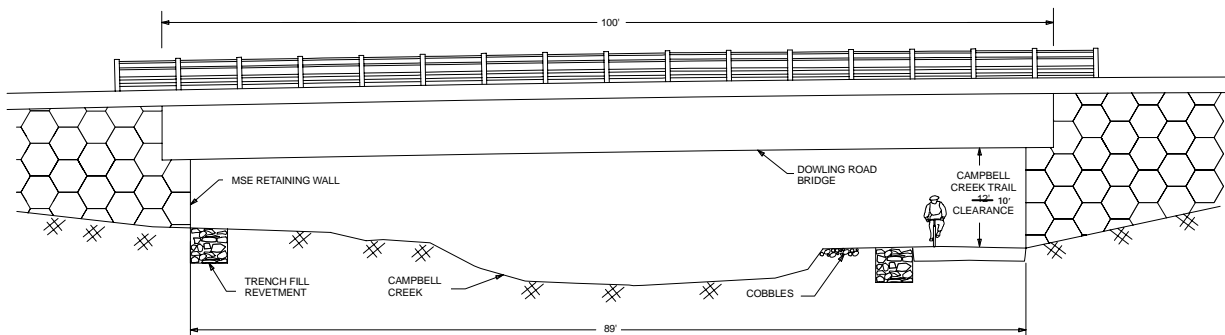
Cross Section of the Campbell Creek Trail Crossing
